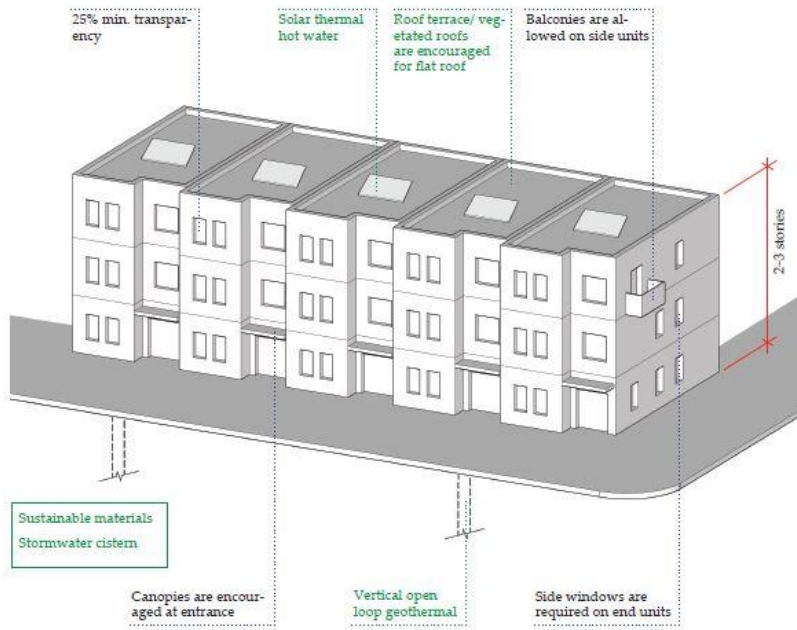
Townhouse buildout example, source: (EDAW Inc., 2009)
